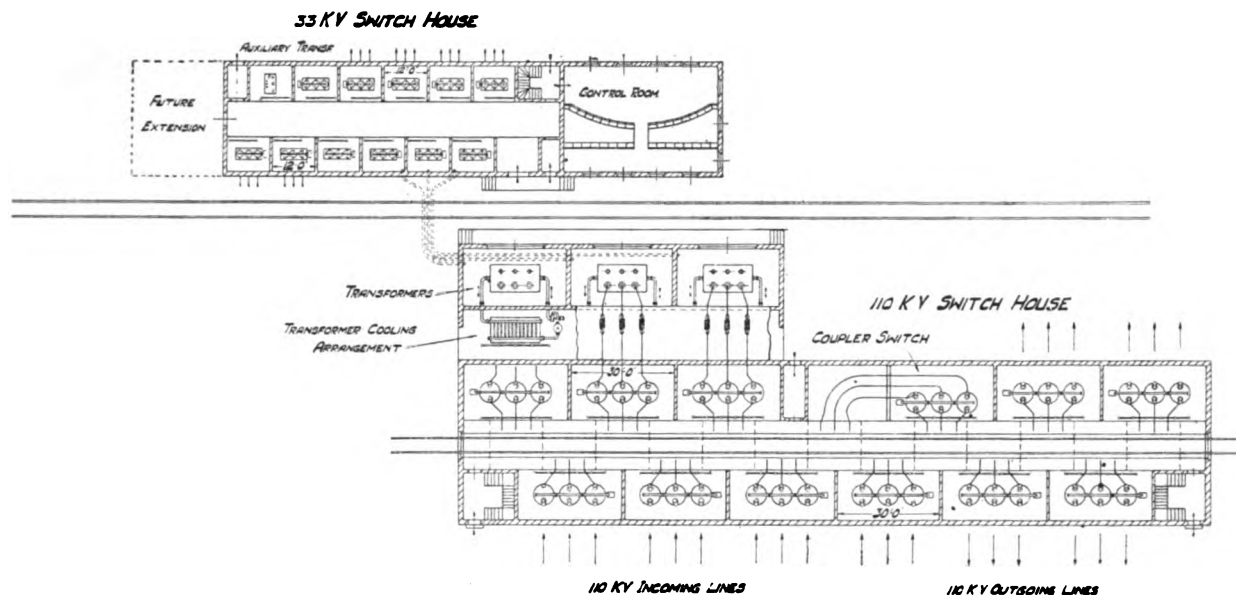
Layout of 110/33-kV indoor station. Plan.
